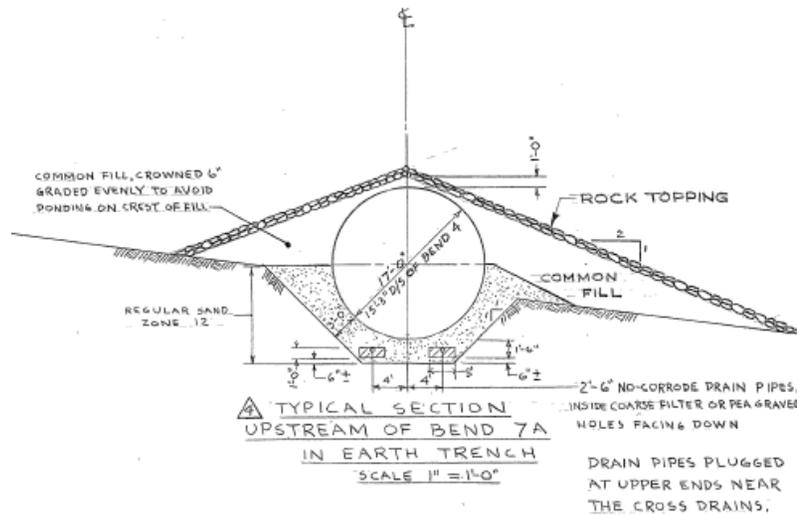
Drawing Half Trench as per "As Built" Drawing
